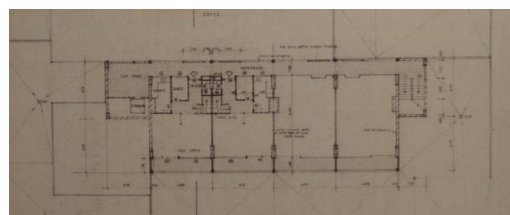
Floor Plan Layout, Bloco Rainha Dona Leonor, Macau
